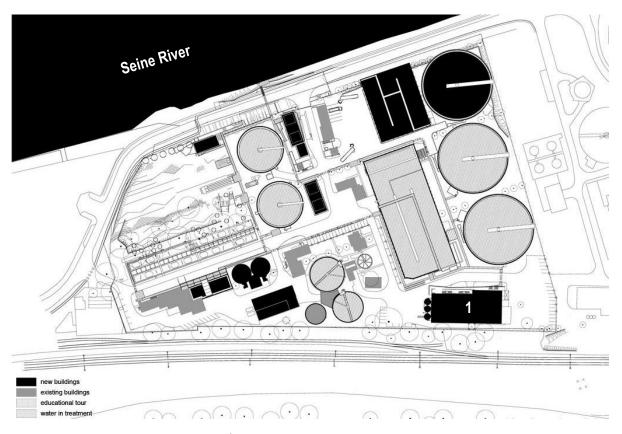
image illustrating site plan of the Évry Water Treatment Plant – where building (1) will be explored in more detail below, (online). 2018.
